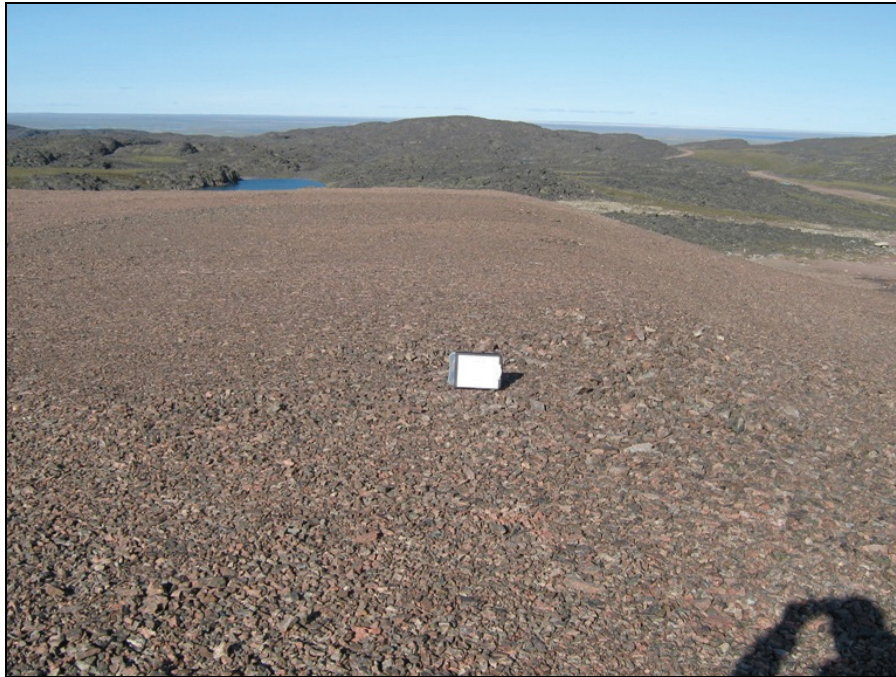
A. Southwest corner at the toe, facing northeast.____ ↑
